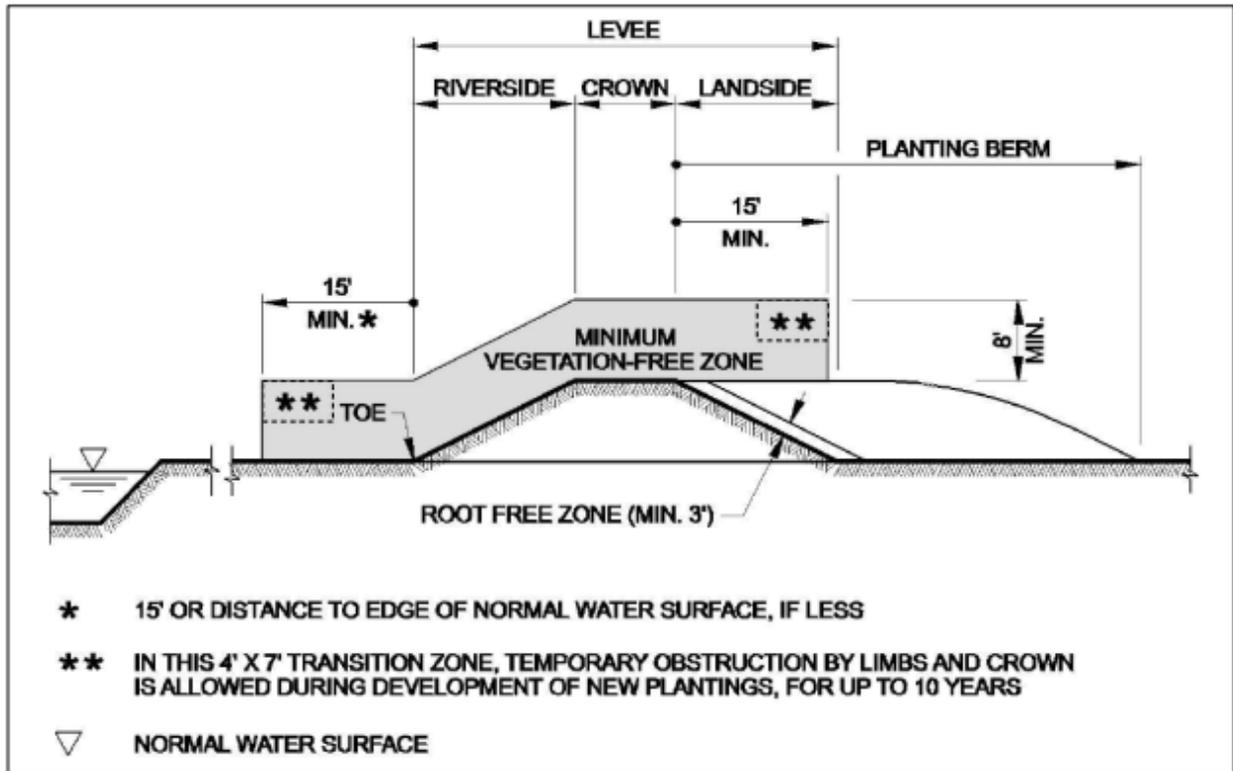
Overbuilt Levee with Planting Berm¹⁰⁷
